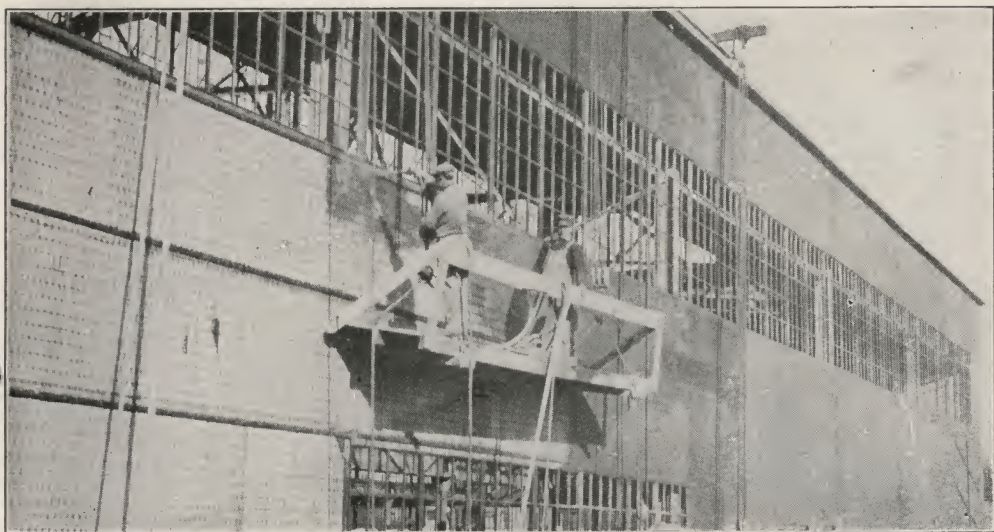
Building side walls of Illinois Steel Company Plant, at South St. Paul, Minn.
